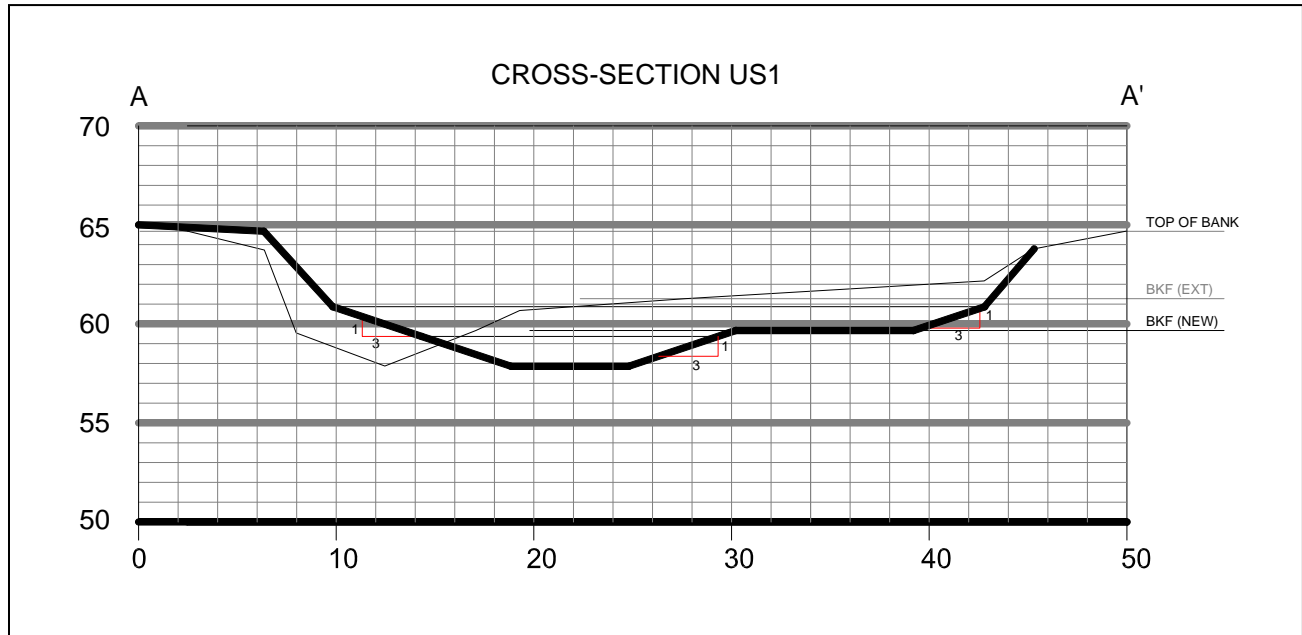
CROSS SECTION 1 UPSTREAM OF BRIDGE (US1).
